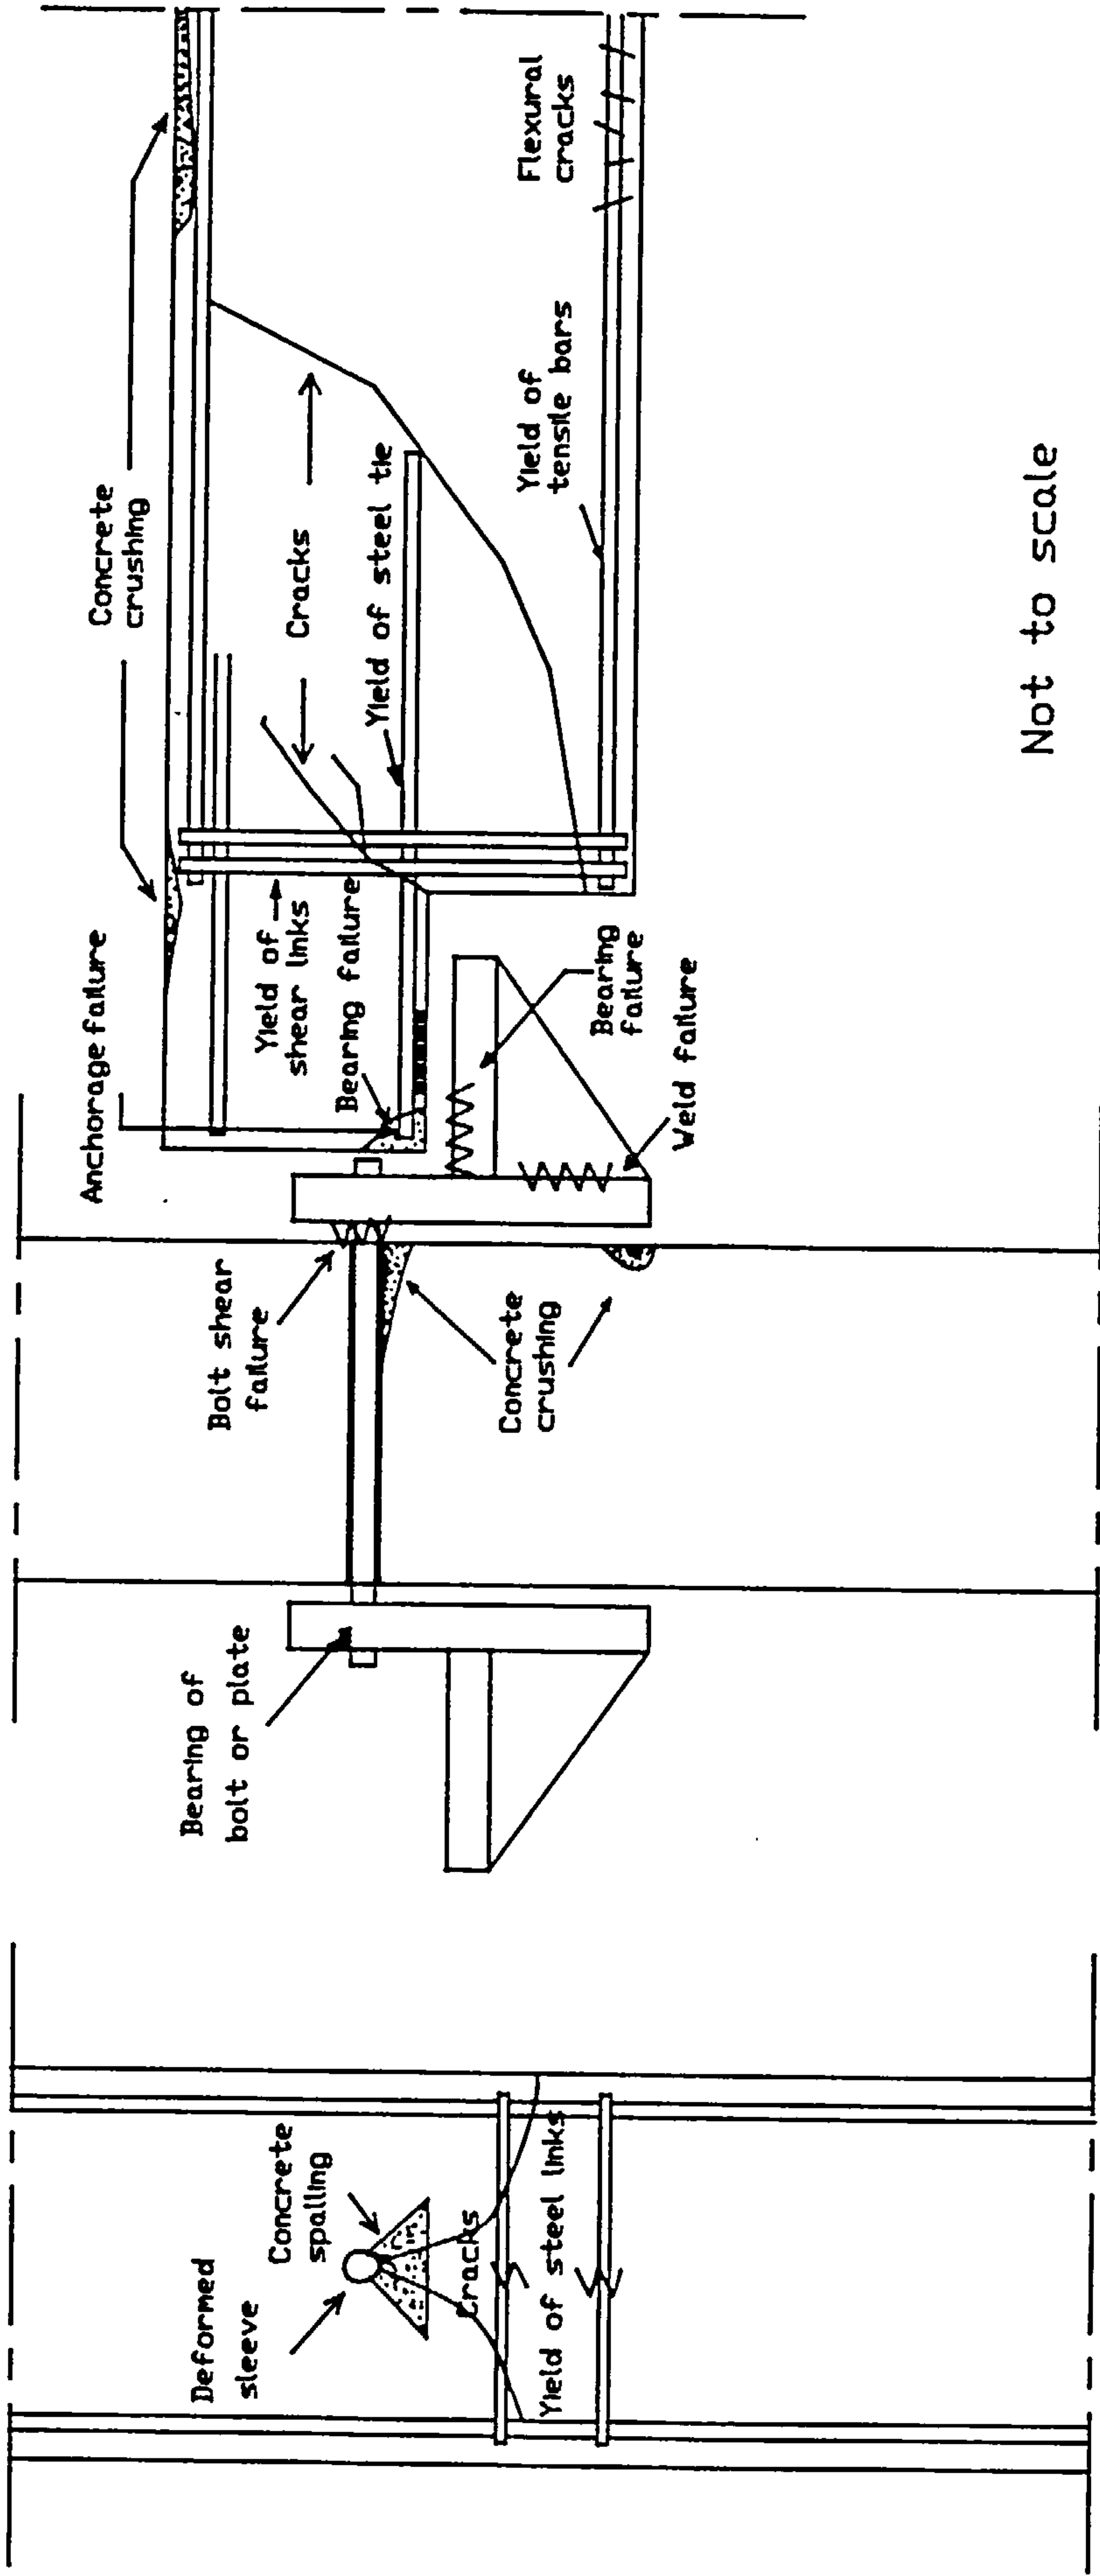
POTENTIAL FAILURE LOCATIONS IN A SLEEVED BOLTS CONNECTION.
